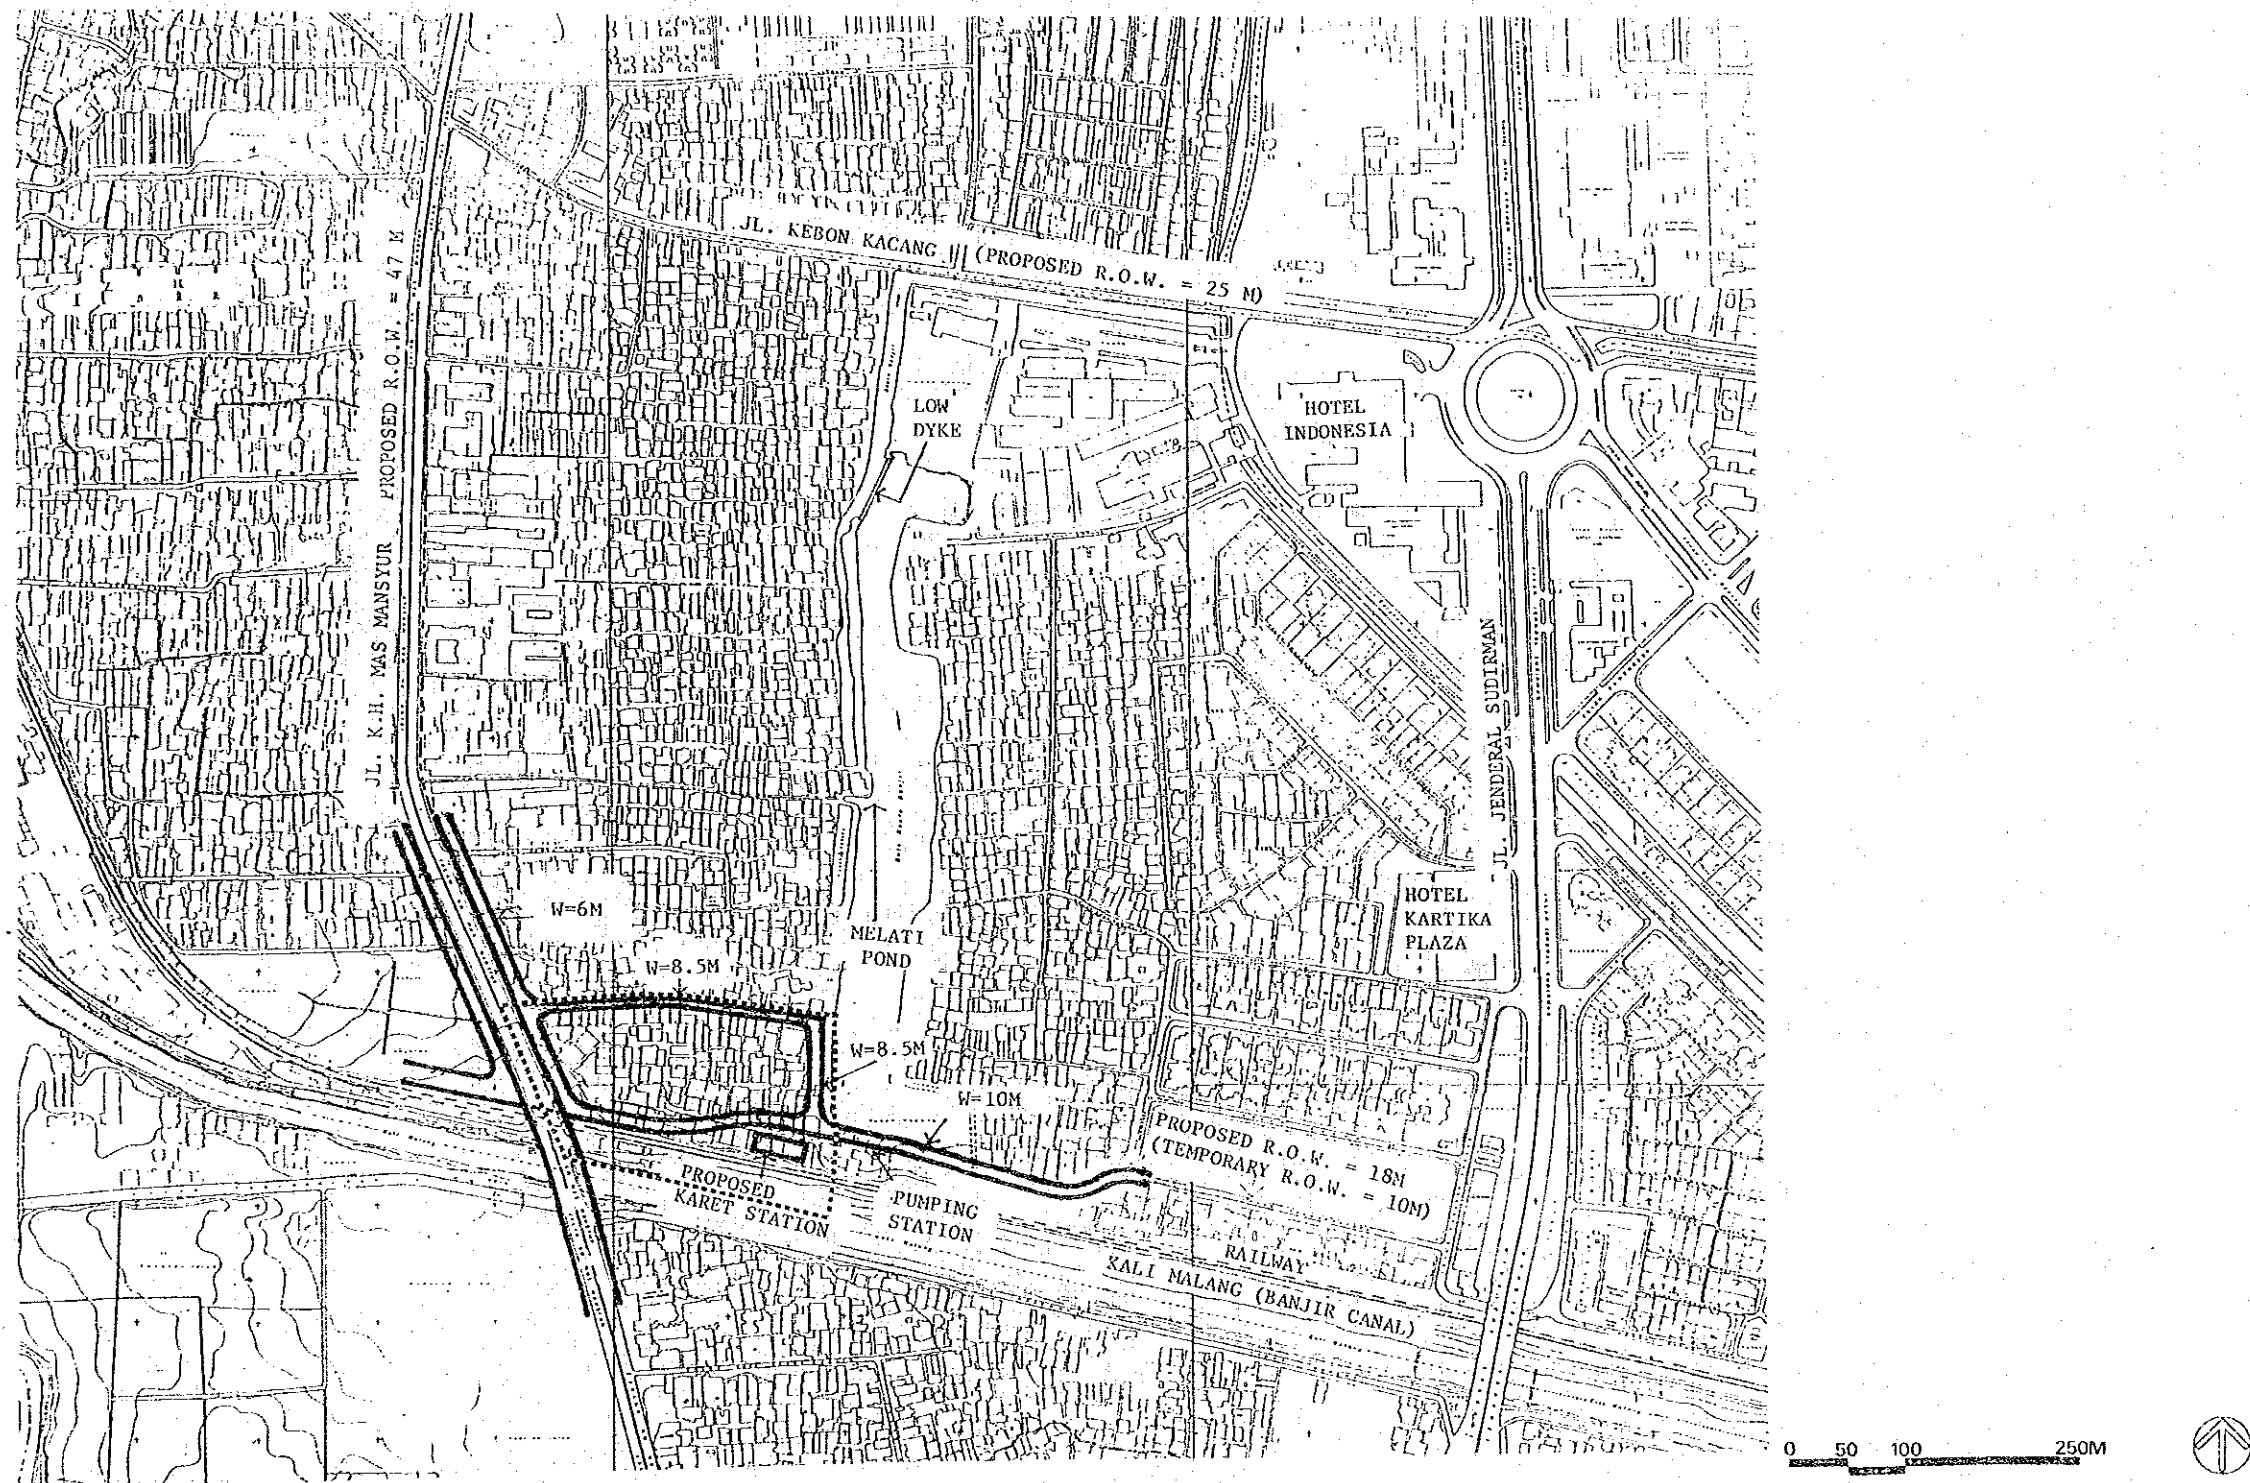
PROPOSED ROADS AND THEIR CONNECTIONS -
